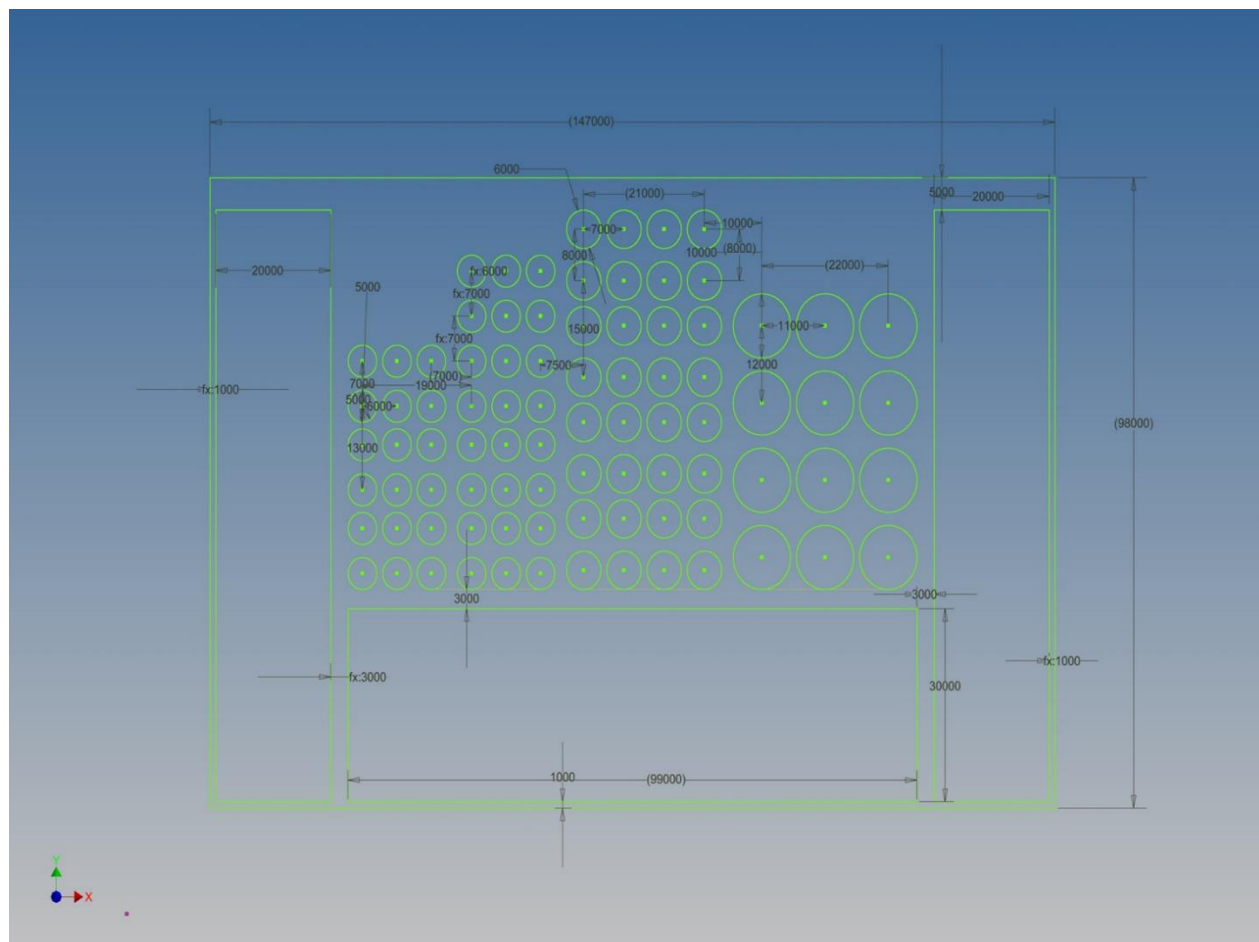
Basic 2D-layout for the Rainbow Trout plant (mm)
